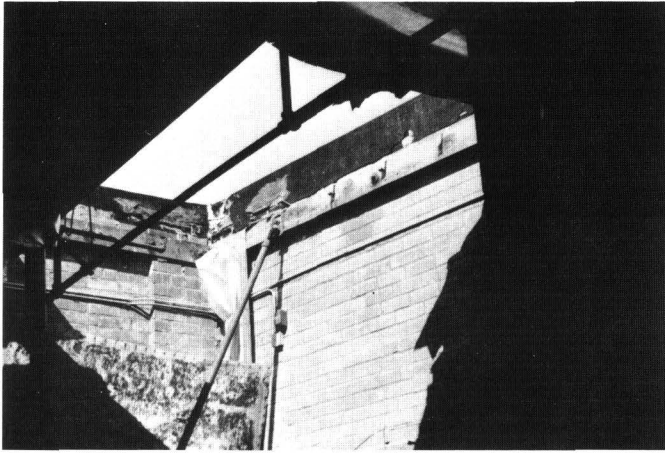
North Oaks. Roof collapse. 19419 Soledad Canyon Road.
